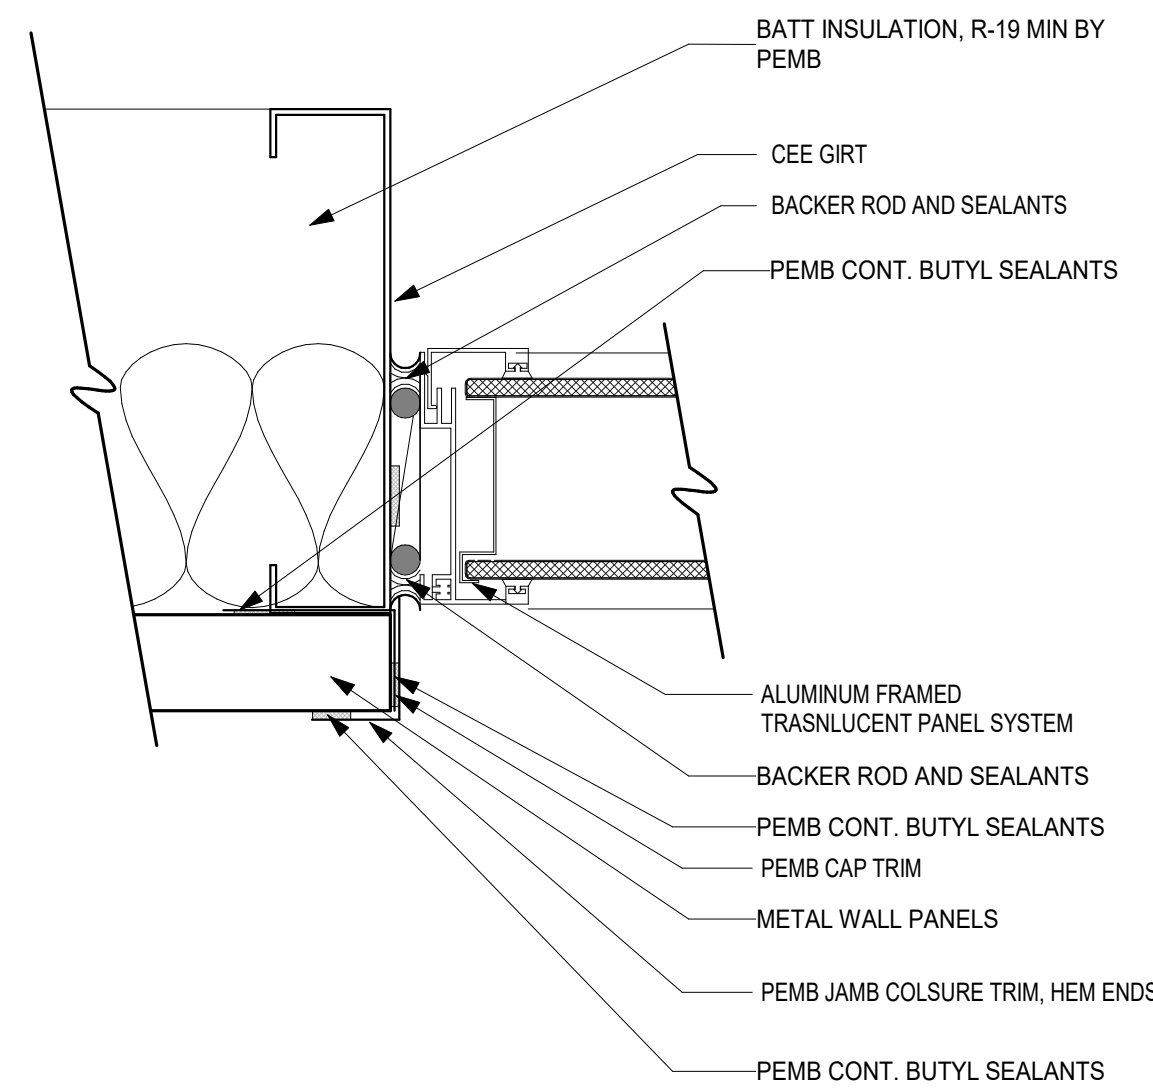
DETAIL - STOREFRONT 2ND FLOOR AT PEBM
